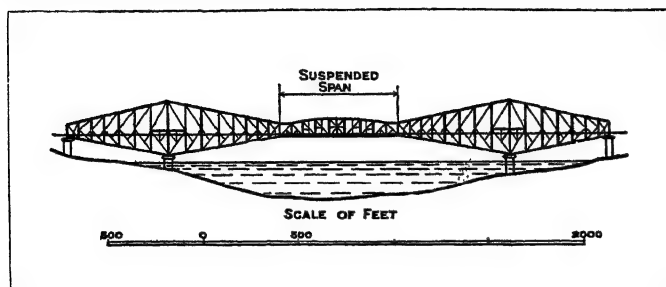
QUEBEC STEEL BRIDGE, CANADA, LARGEST CANTILEVER BRIDGE IN THE WORLD
